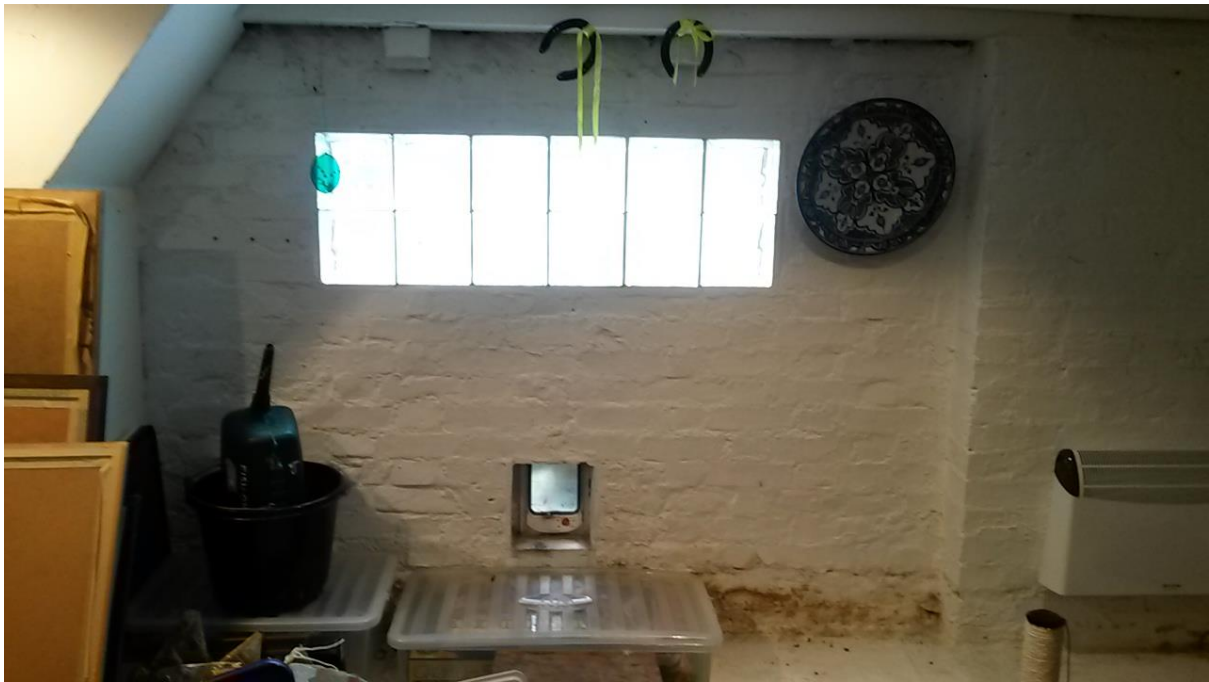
(above): Existing glazed blocks inserted into rear fenestration of 56 Croftdown Road at basement level, as viewed from existing basement
